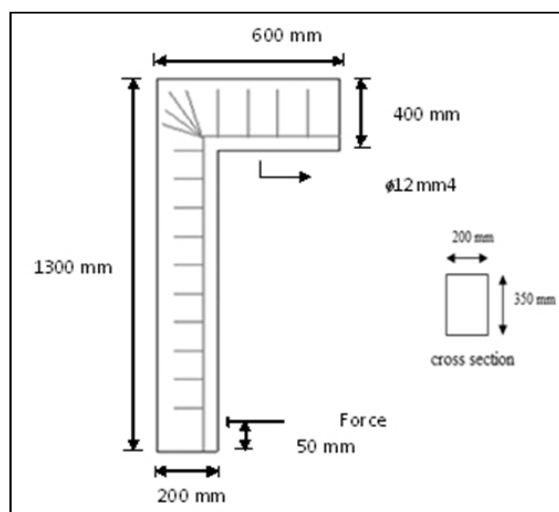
Reinforcement Detail with Stirrups (ST2).^[9]
